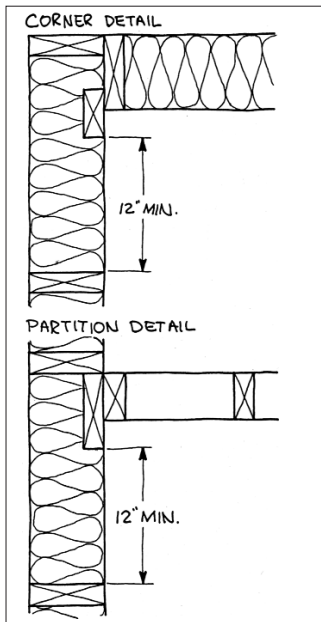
When framing corners (top) and partition junctures (bottom), leave one side open for spraying, and leave at least 12 inches to the next stud for spraying access.
